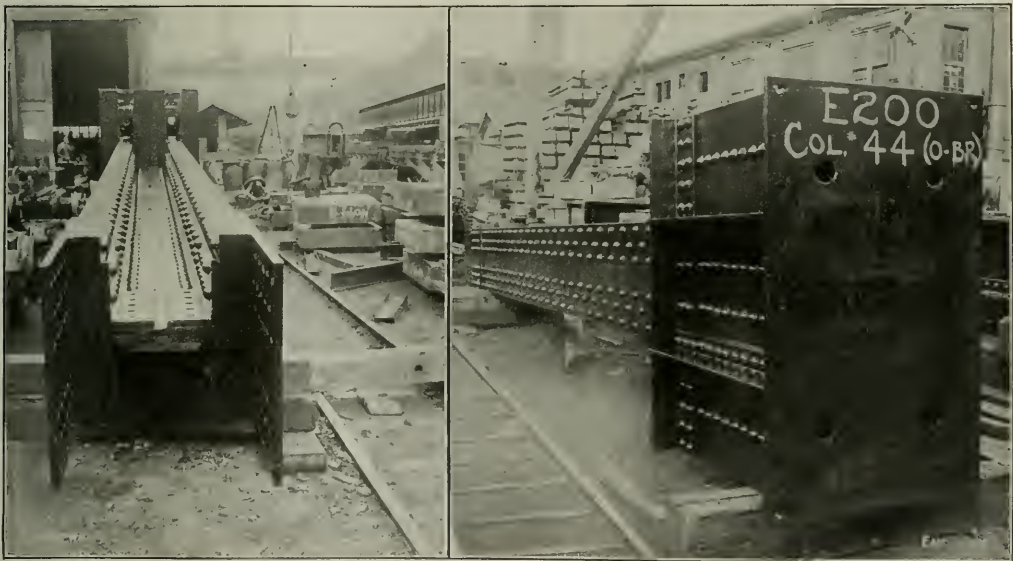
AN ANCHOR COLUMN OF THE EQUITABLE BUILDING, IN THE PENCYD SHOP YARD
